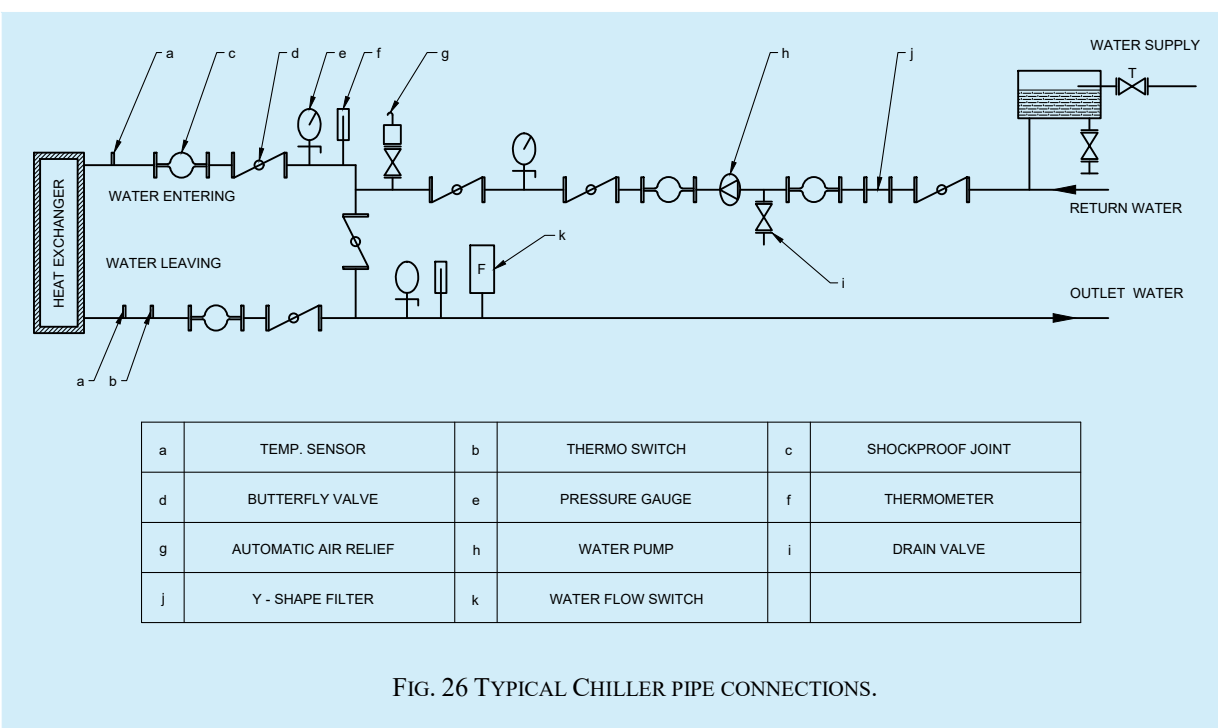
TYPICAL CHILLER PIPE CONNECTIONS.
